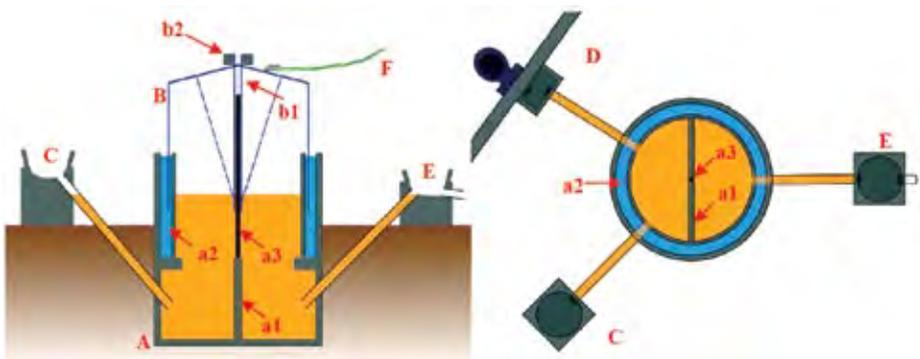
Cross section and top view of a 2 m<sup>3</sup> toilet linked plant installed in Kumbalangi. A) digester tank, a1) orthogonal barrier, a2) water jacket, a3) metallic central axle, B) gasholder drum, b1) central tube, b2) 20 kg stone, C) food waste inlet, D) toilet waste inlet, E) effluent outlet, F) biogas outlet.
